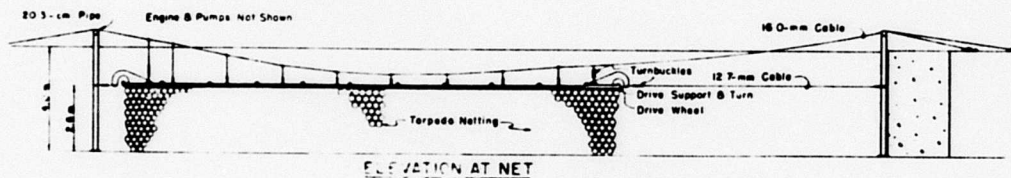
ELEVATION VIEW OF TRAVELLING DEBRIS SCREEN⁽¹⁾
